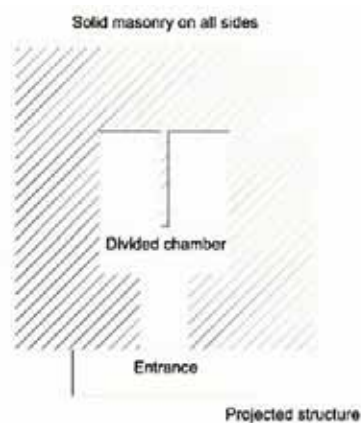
The typical internal layout of a miniature projecting structure on the picture wall.
